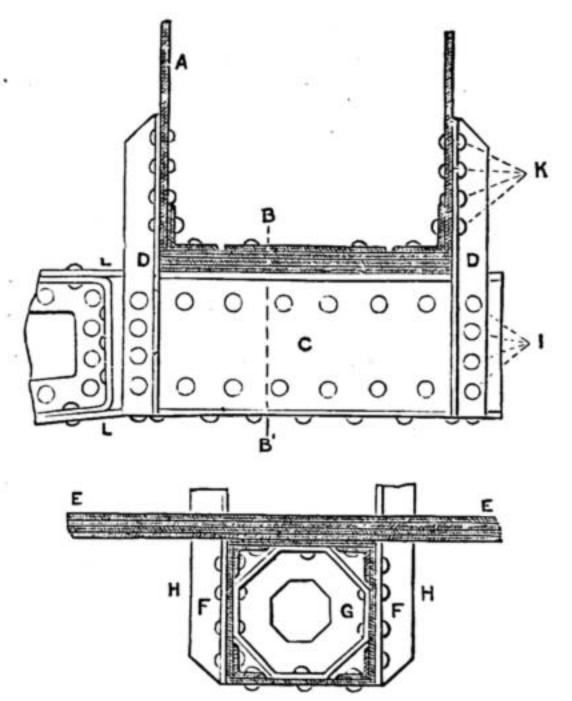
Connection of Cross Girder with Box Main Girder.
